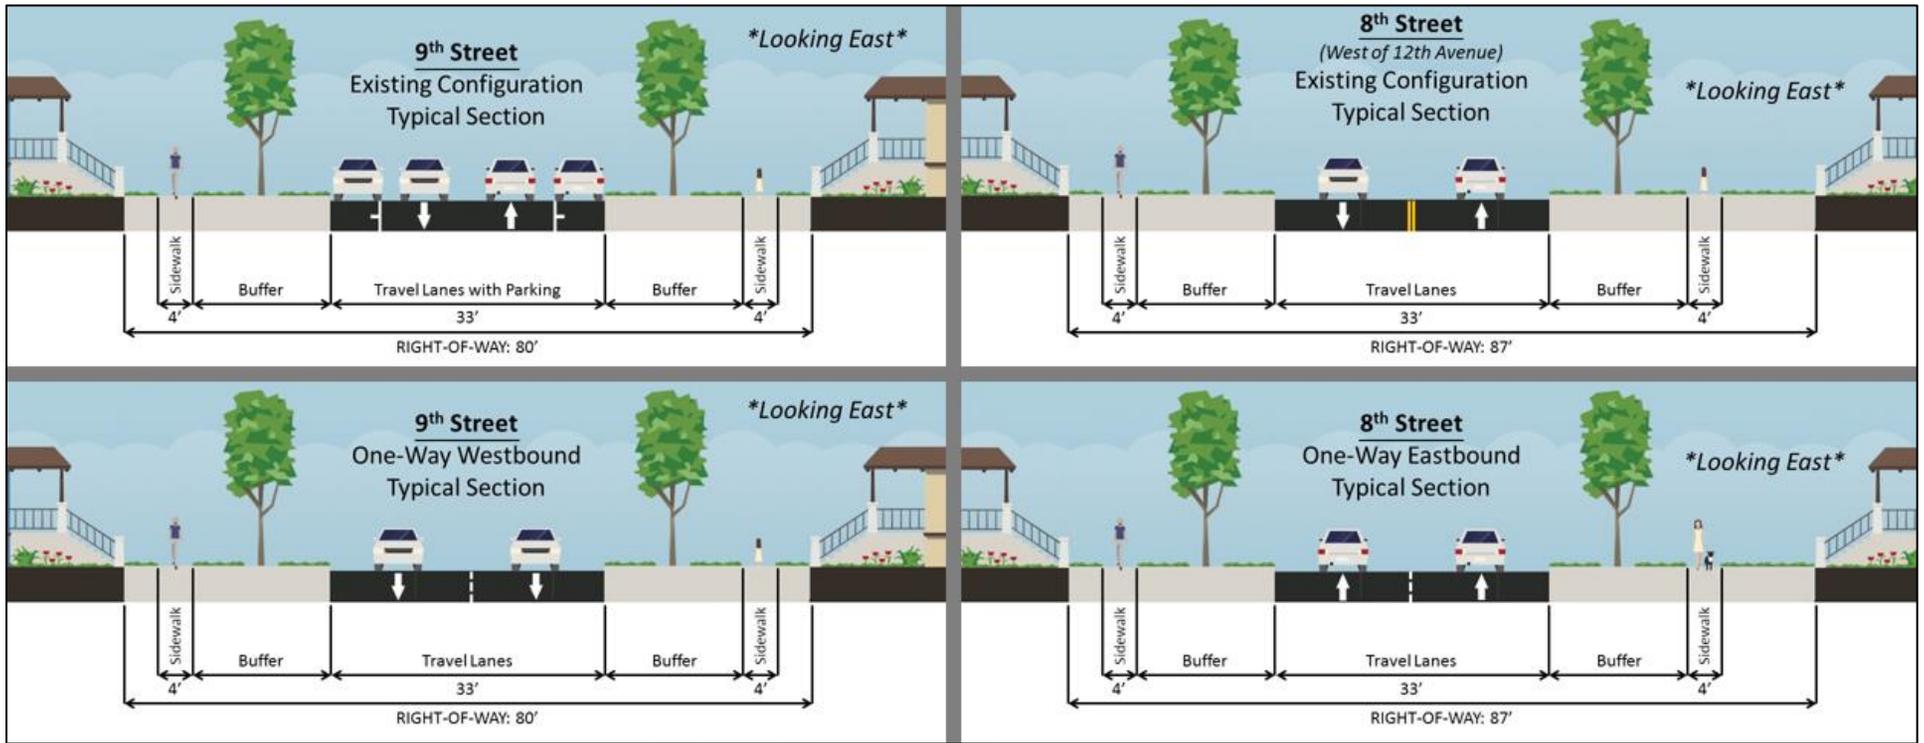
Alternative 3A – Typical Sections along 8th Street and 9th Street
